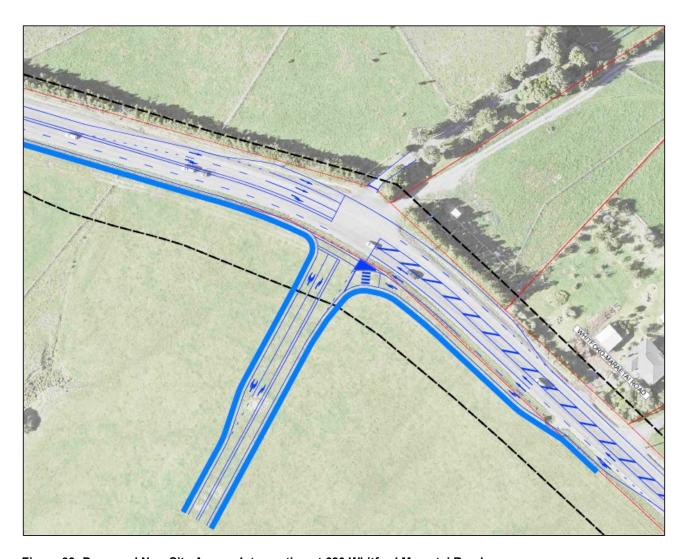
Proposed New Site Access Intersection at 620 Whitford Maraetai Road
